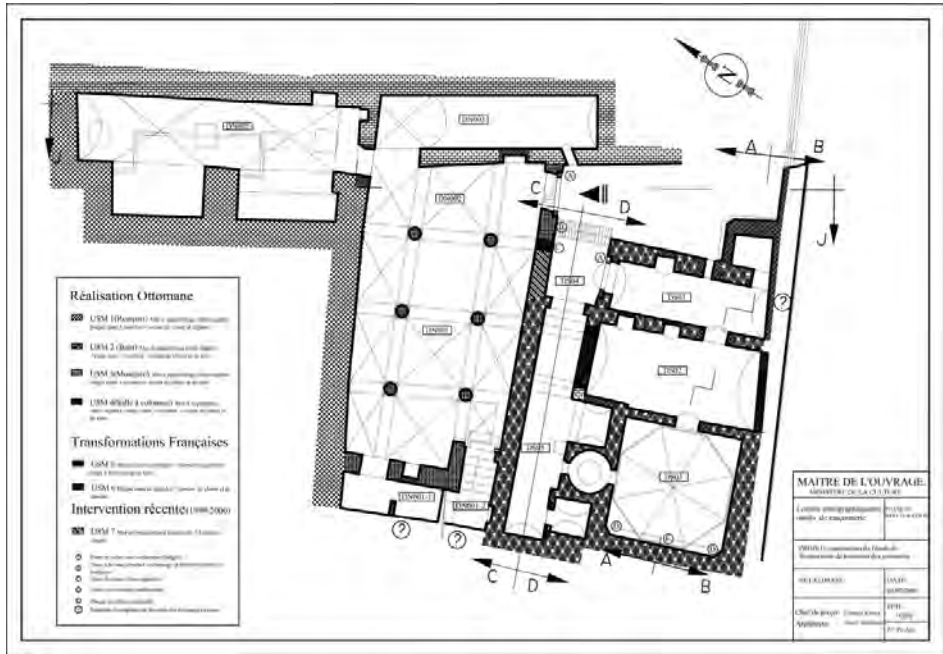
Stratification plan of the Janissary bath (Author, 2008).
